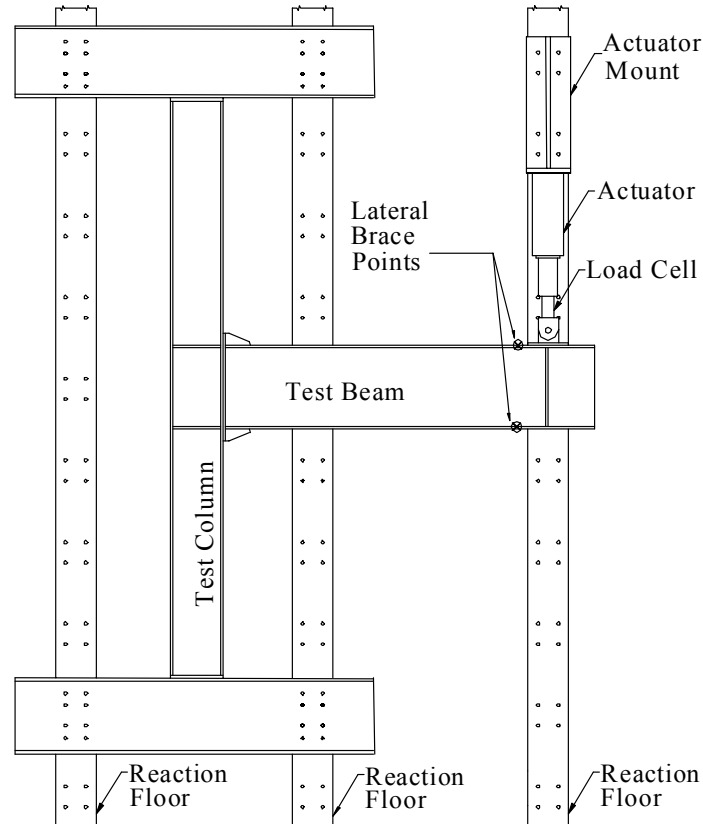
PLAN VIEW OF TYPICAL TEST SETUP
